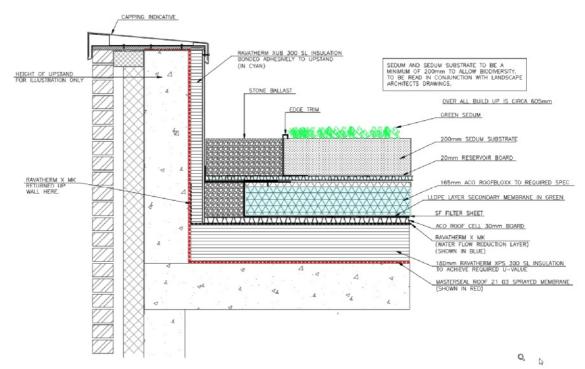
Green and Blue Roof (Minimum 200mm substrate)
